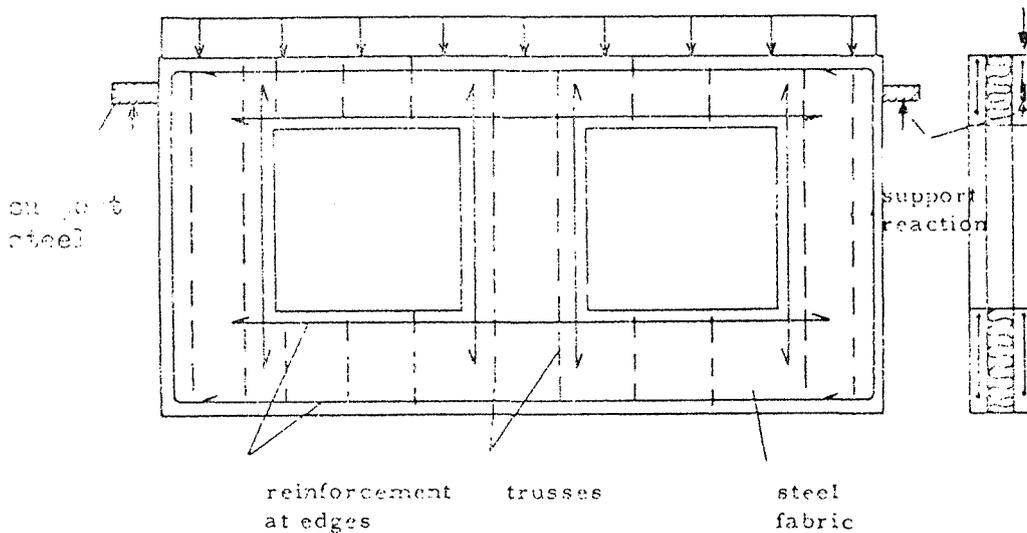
Structure and behaviour of the sandwich wall element supported at its edges (drawing of principle).
